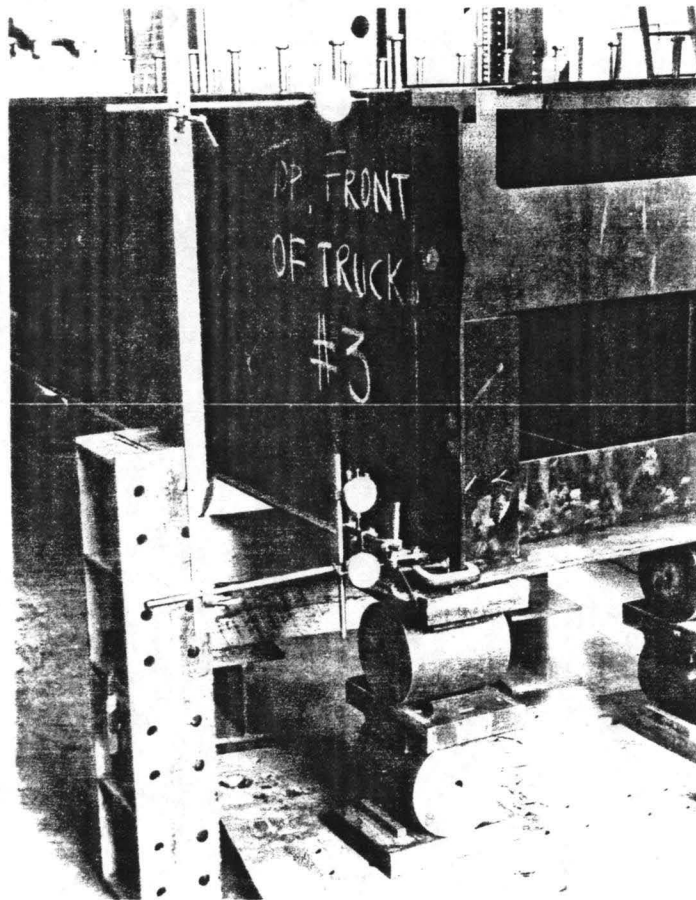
View of Roller Assemblies Used at Each of the Four Supports
